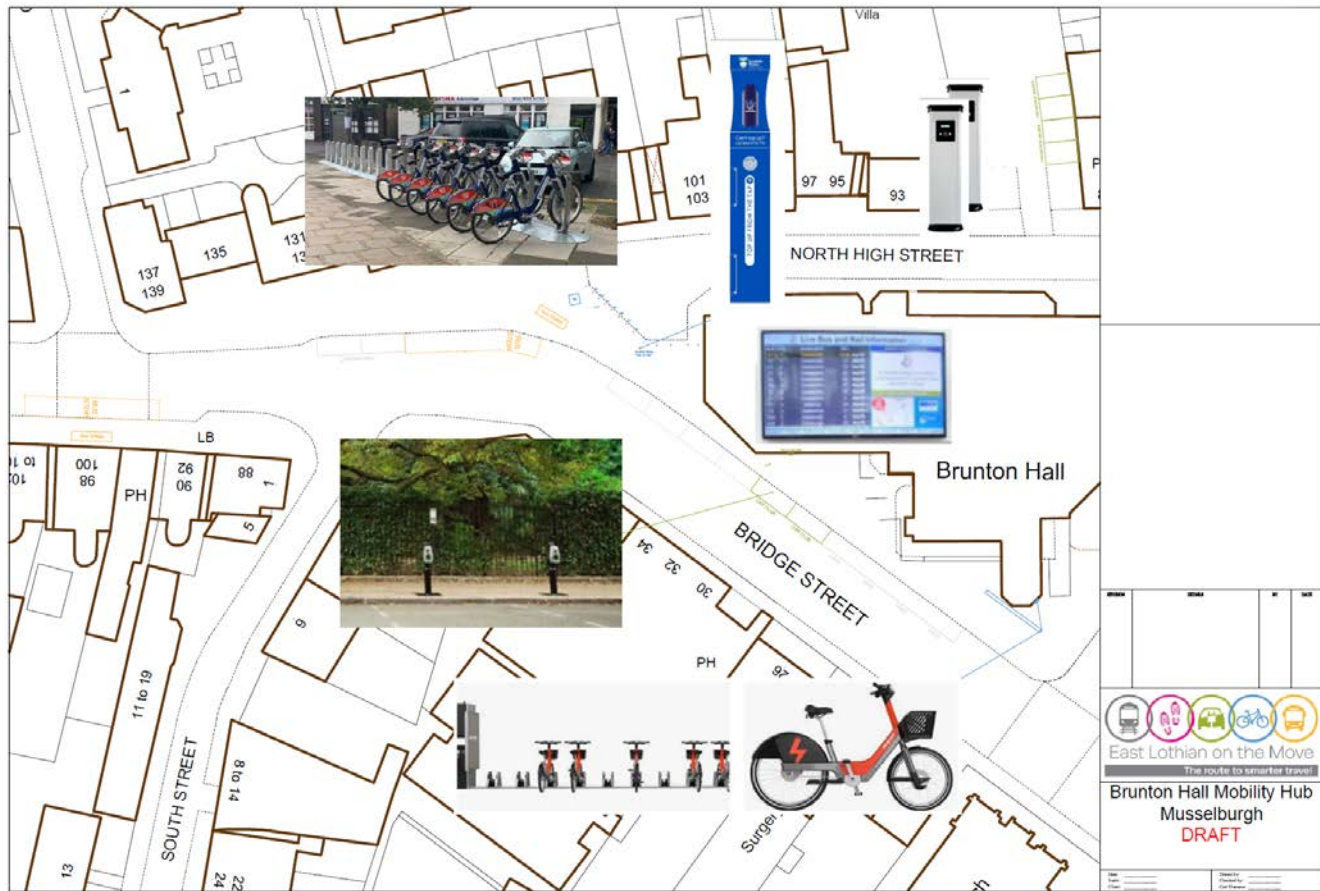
Sketch of plans for Brunton Hall Multi-Hub stage 1
